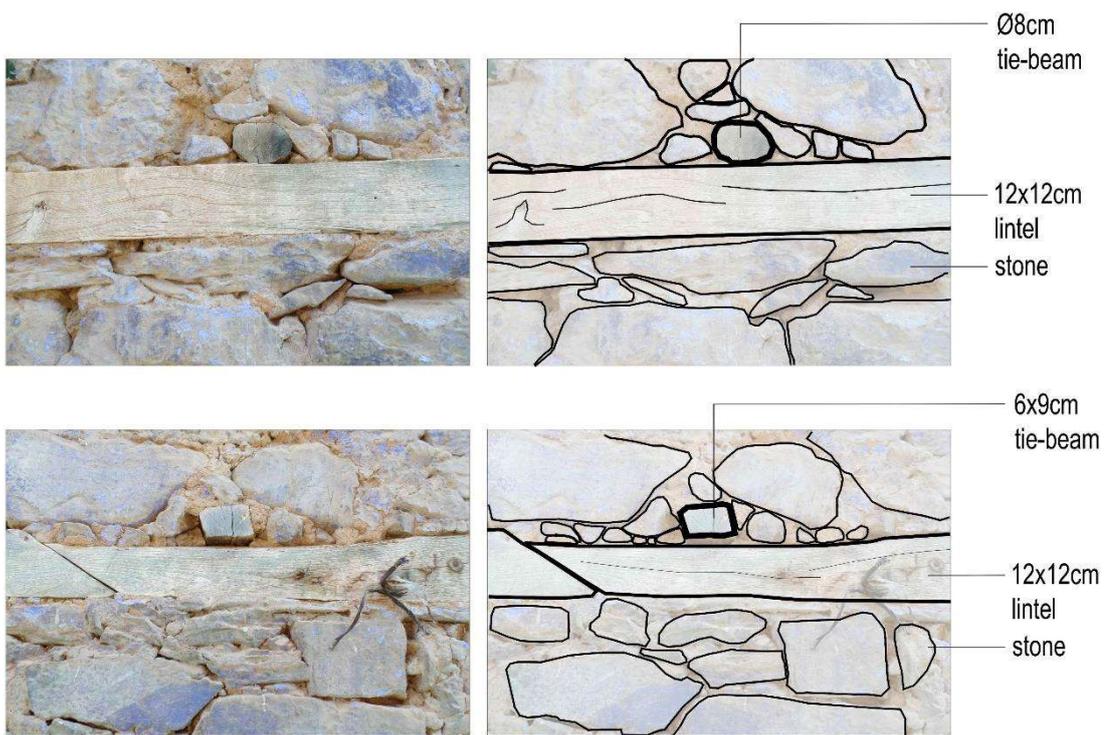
Masonry stone wall with timber lintels and tie beams in different forms (lot no:2800-3)
